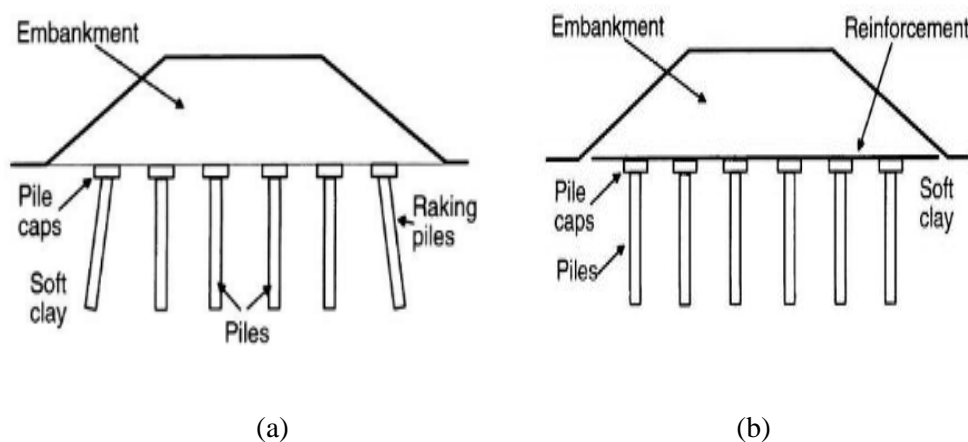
Typical piled embankments (a) Conventional piled embankment (b) Piled embankment with basally reinforcement
